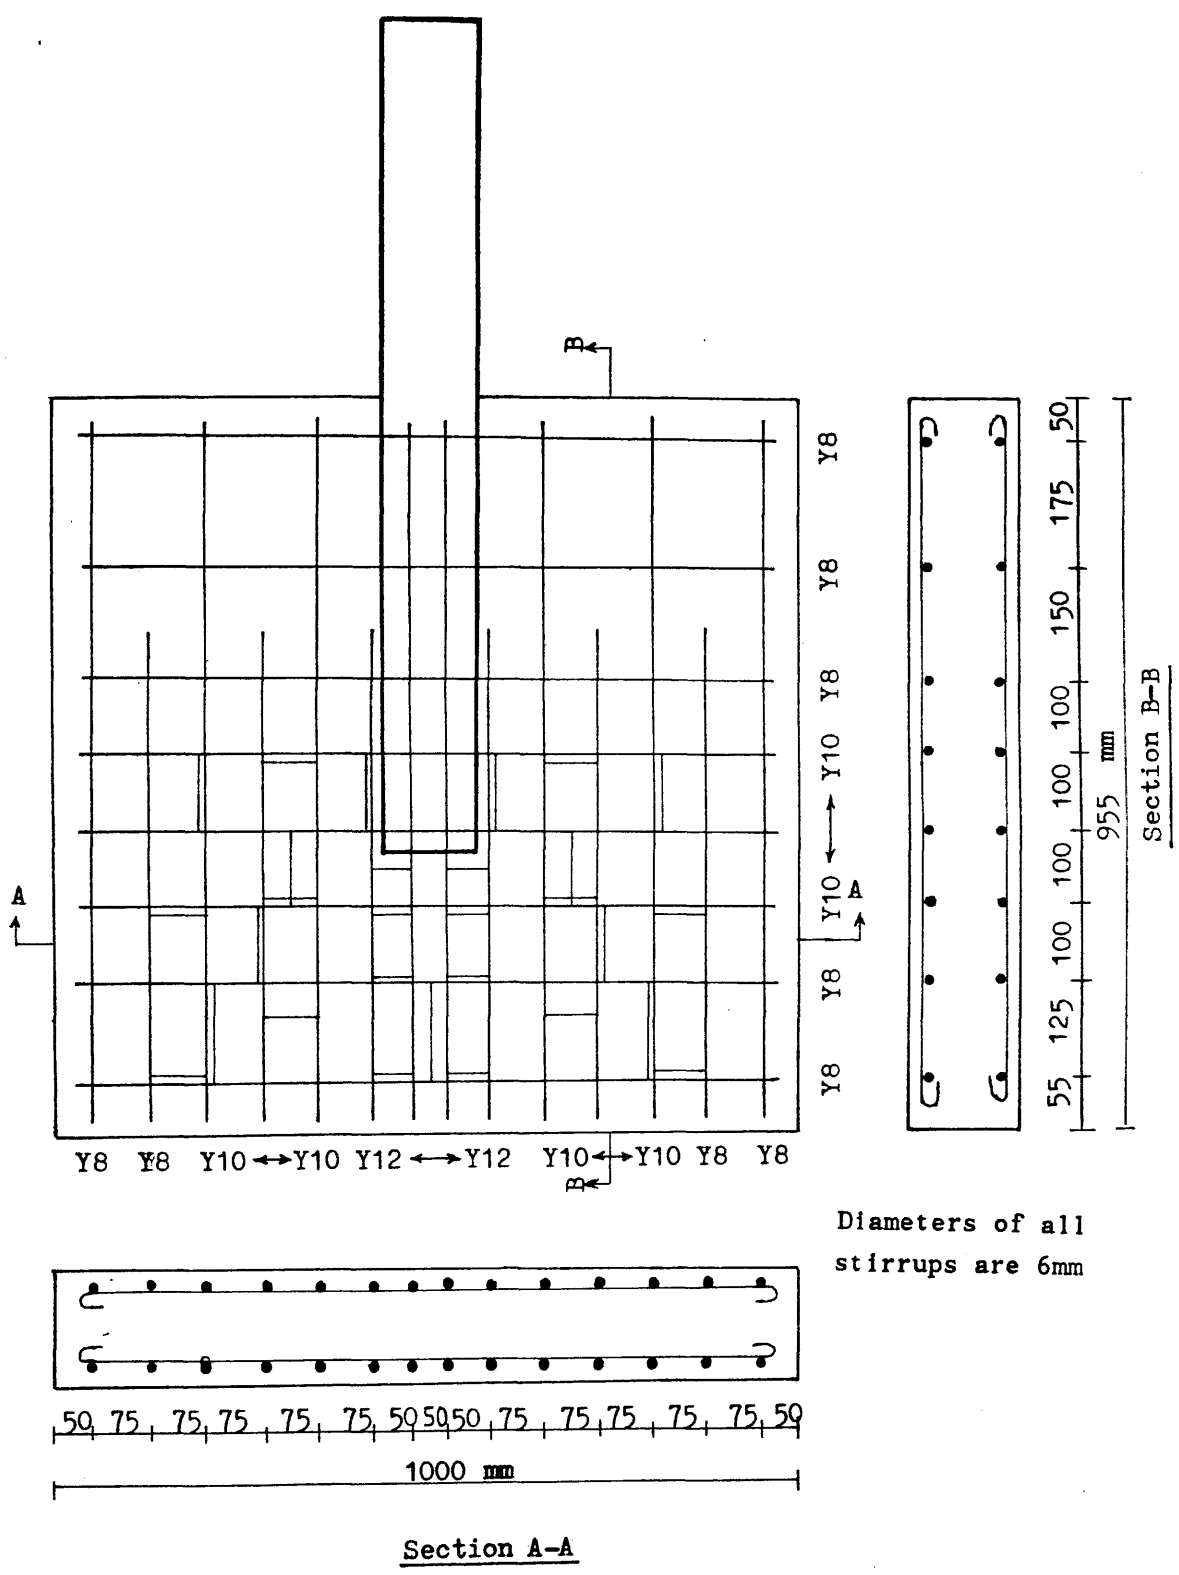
Arrangement of top and bottom reinforcing bars including closed vertical stirrup in the slab of model MRS15 (top and bottom steel bars are identical)
